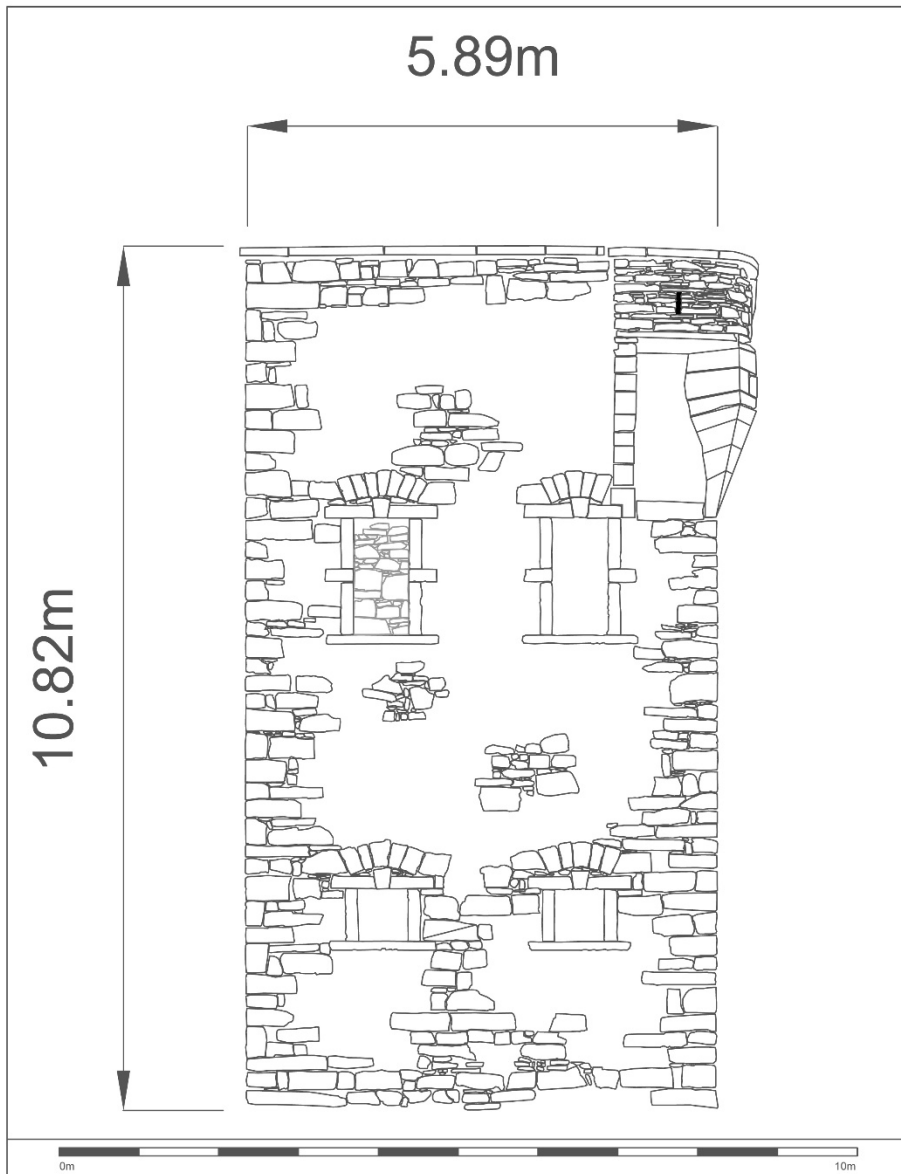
External elevation of the west wall of the signal tower at Carrowmably Signal Station. The gun-loop on the west side of the south-west bartizan is shaded black.
